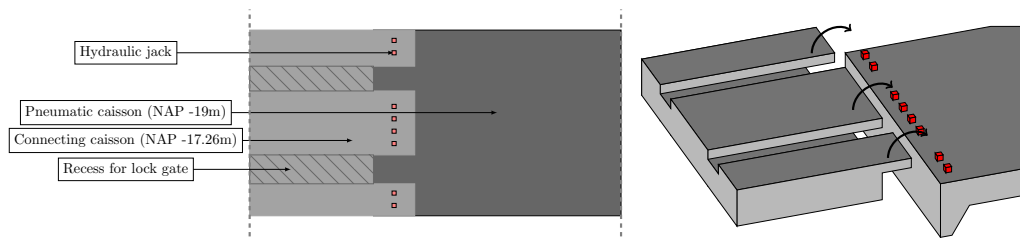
Top view and three dimensional view of the connection between caisson and pneumatic caisson
